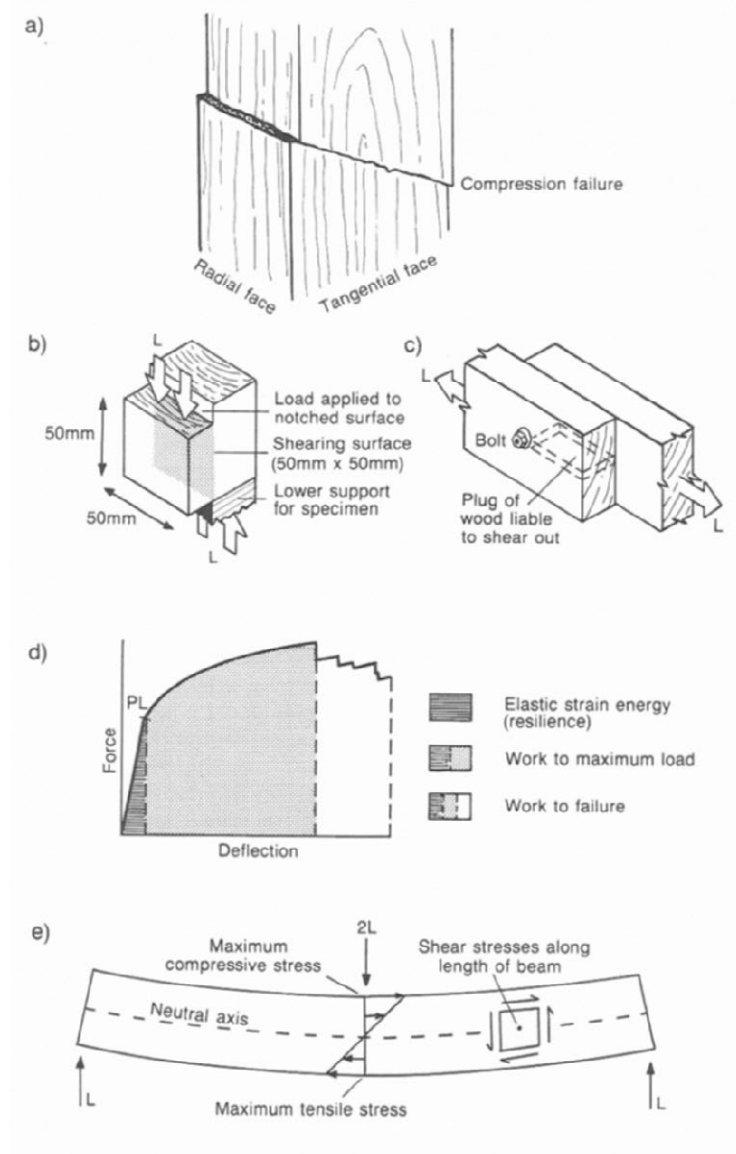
Examples of failure modes and bending tests. (a) Buckling failure of short specimens compressed parallel to grain (ASTM, 2005a). (b) Shear test of notched specimen: wood has low shear strength parallel to grain. (c) Low shear strength: timber members in tension parallel to grain cannot be readily connected with bolts, which tend to pull out under comparatively small loads. (d) Load-deflection curve during a bending test. (e) A three-point bending test, with maximum deflection at mid-span.
